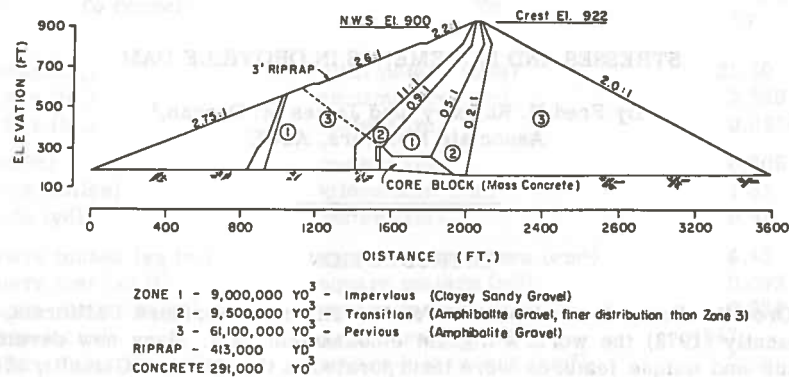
OROVILLE DAM MAXIMUM SECTION
